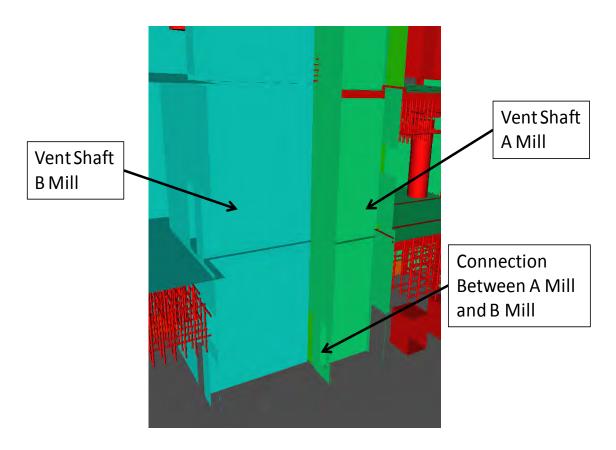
Mill A and B Vertical Section through Air Shaft
